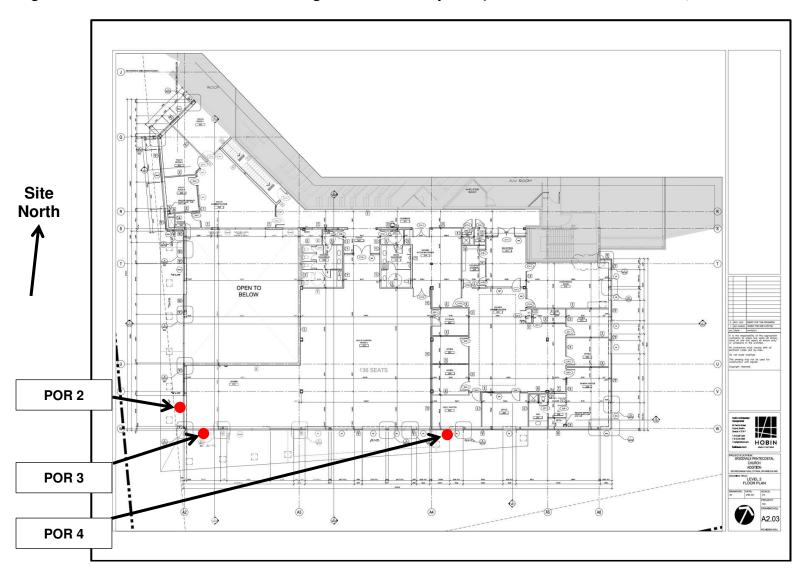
Building Elevations showing Points of Reception (Source: Hobin Architecture Inc.)
